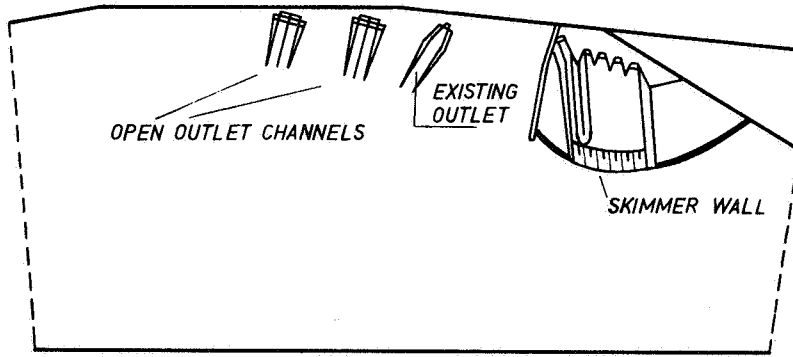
LOW-MIXING DESIGN WITH SKIMMER WALL
